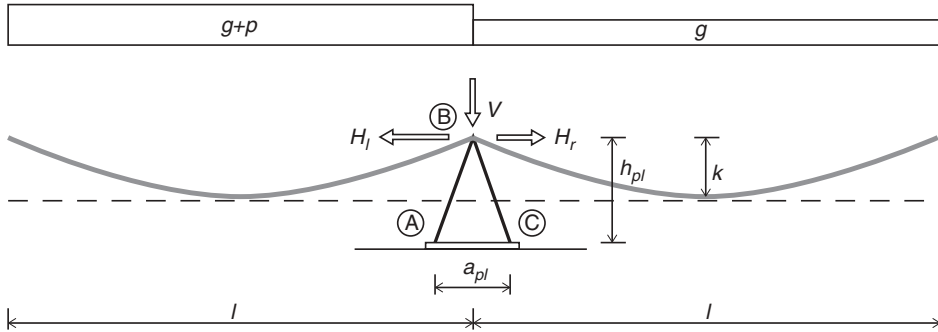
Triangular pylon structure in a multi-span suspension bridge
